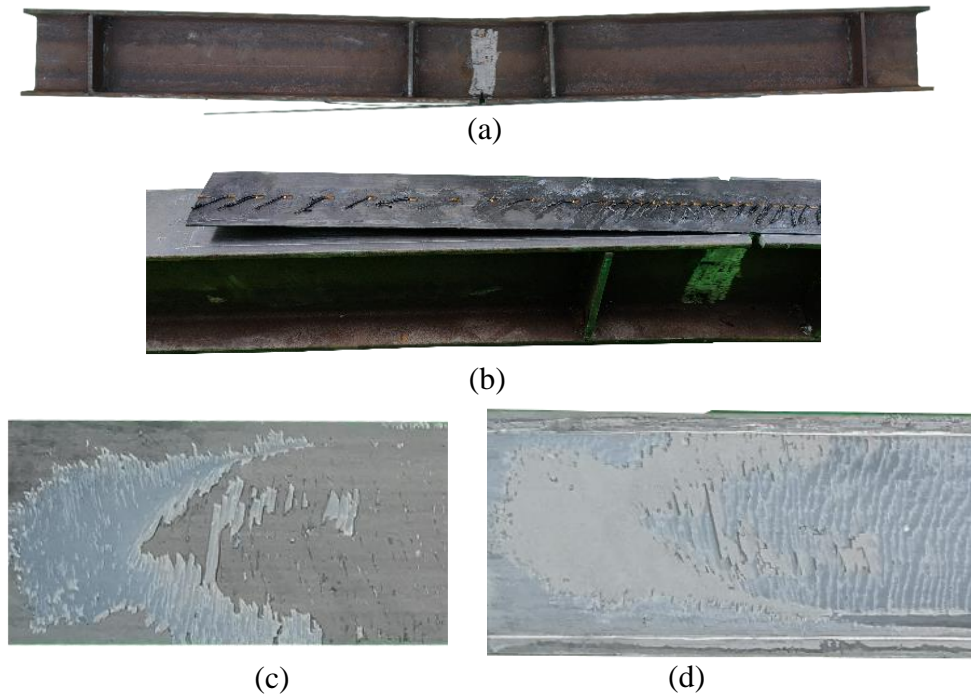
Typical failure mode of CFRP-retrofitted steel beams: a) front view; b) closed view of the debonded side; close views of the debonded surface c) on the CFRP plate; d) on the substrate steel side.
